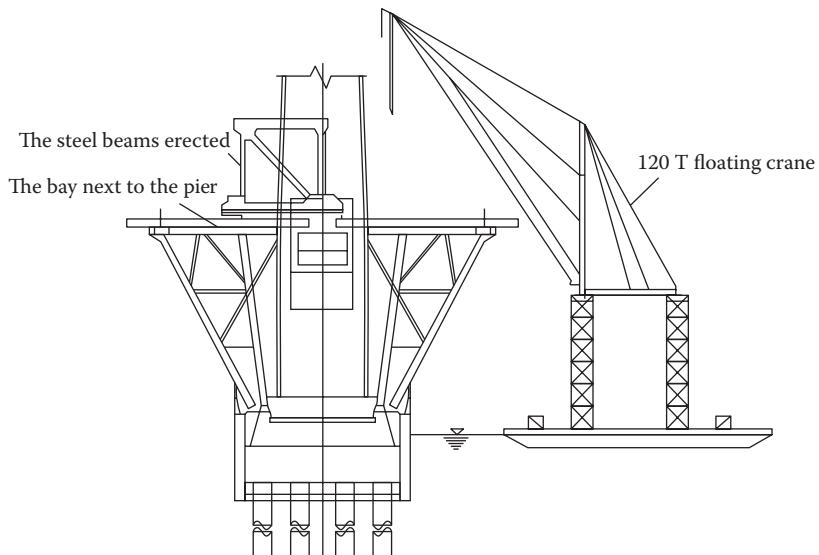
Interpanel steel truss segment erection over pier top. (From Hu, H.Z., *Bridge Constr.*, 3, 1–4, 2007.)
